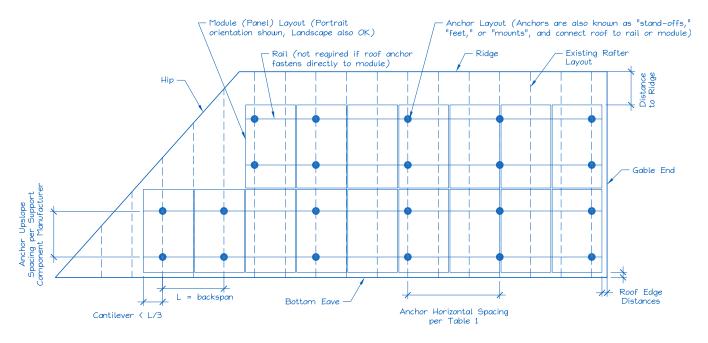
Sample Solar Panel Array and Anchor Layout Diagram (Roof Plan).
